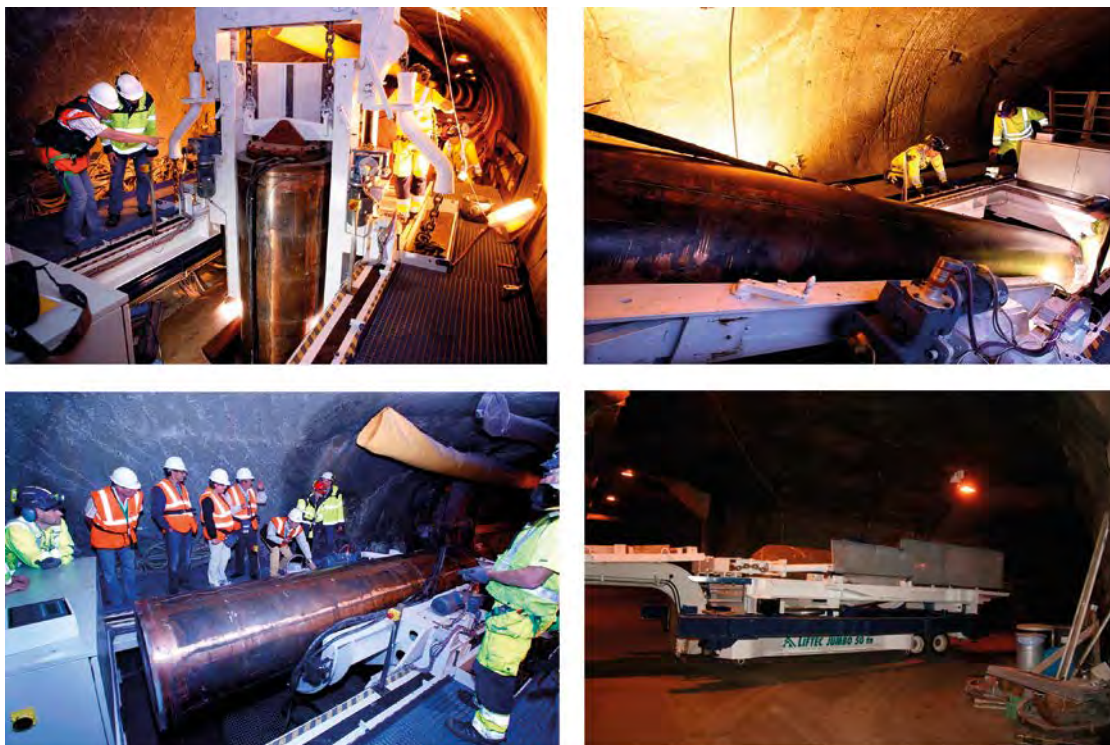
Top left: Canister lifted vertically up from the deposition hole. Top right: Canister tilted horizontally. Bottom left: Canister placed on the deposition machine. Bottom right: Deposition machine with canister placed on a trailer. (Figure 4-10 in Johannesson and Hagman 2013.)
